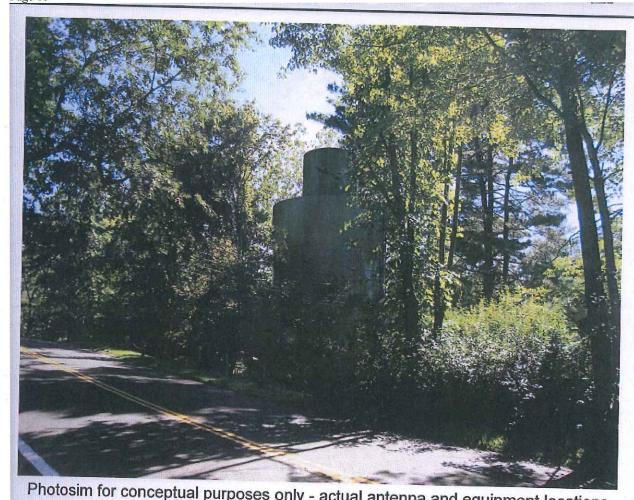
Drawing showing water tank and proposed tower installation. (AT&T 1, Tab B)
